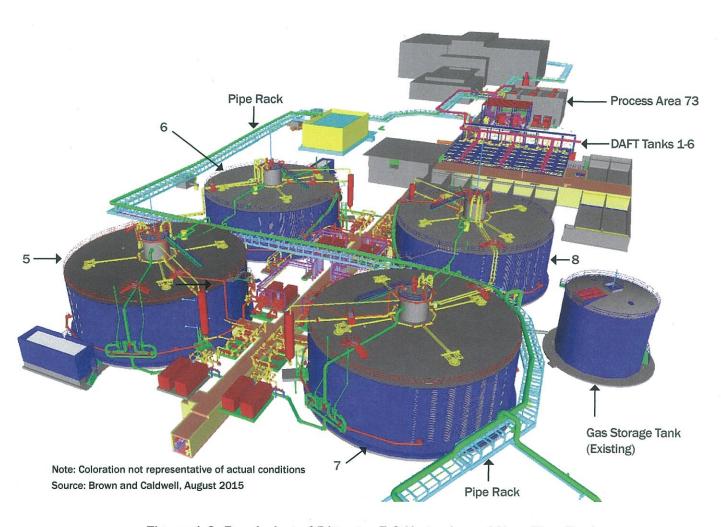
Rendering of Digester 5-8 Upgrade and New Pipe Rack
